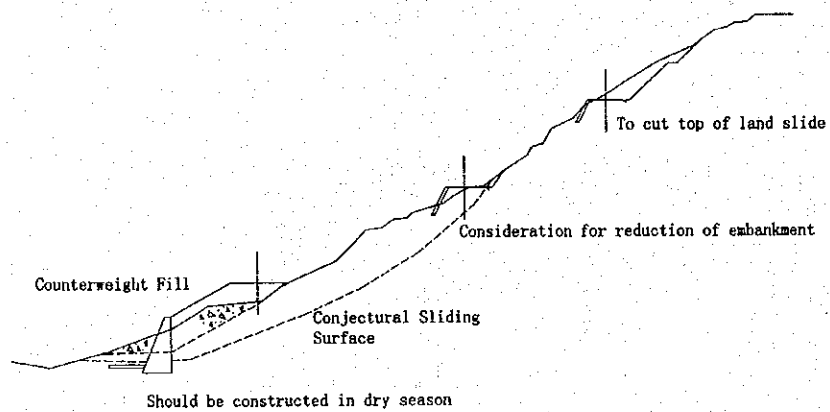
Road Plan on the Chiyabari Landslide
